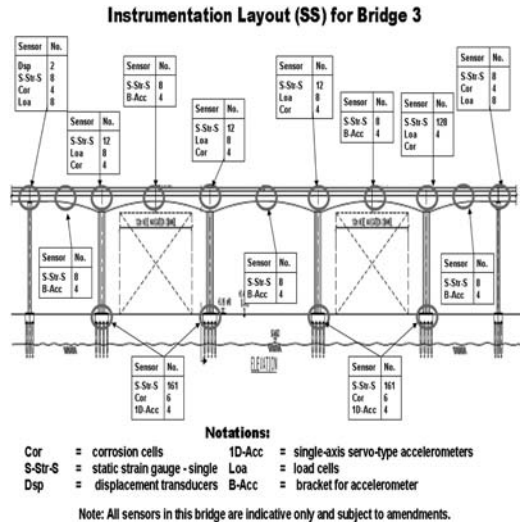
Instrumentation Layout of Sensory Systems in Bridge 3 (5-span bridge: 100 m + 150 m × 3 + 100 m = 650 m).
